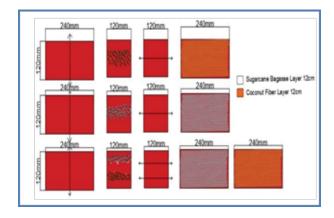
Sugarcane bagasse and coconut fibre cross sectional bricks.
